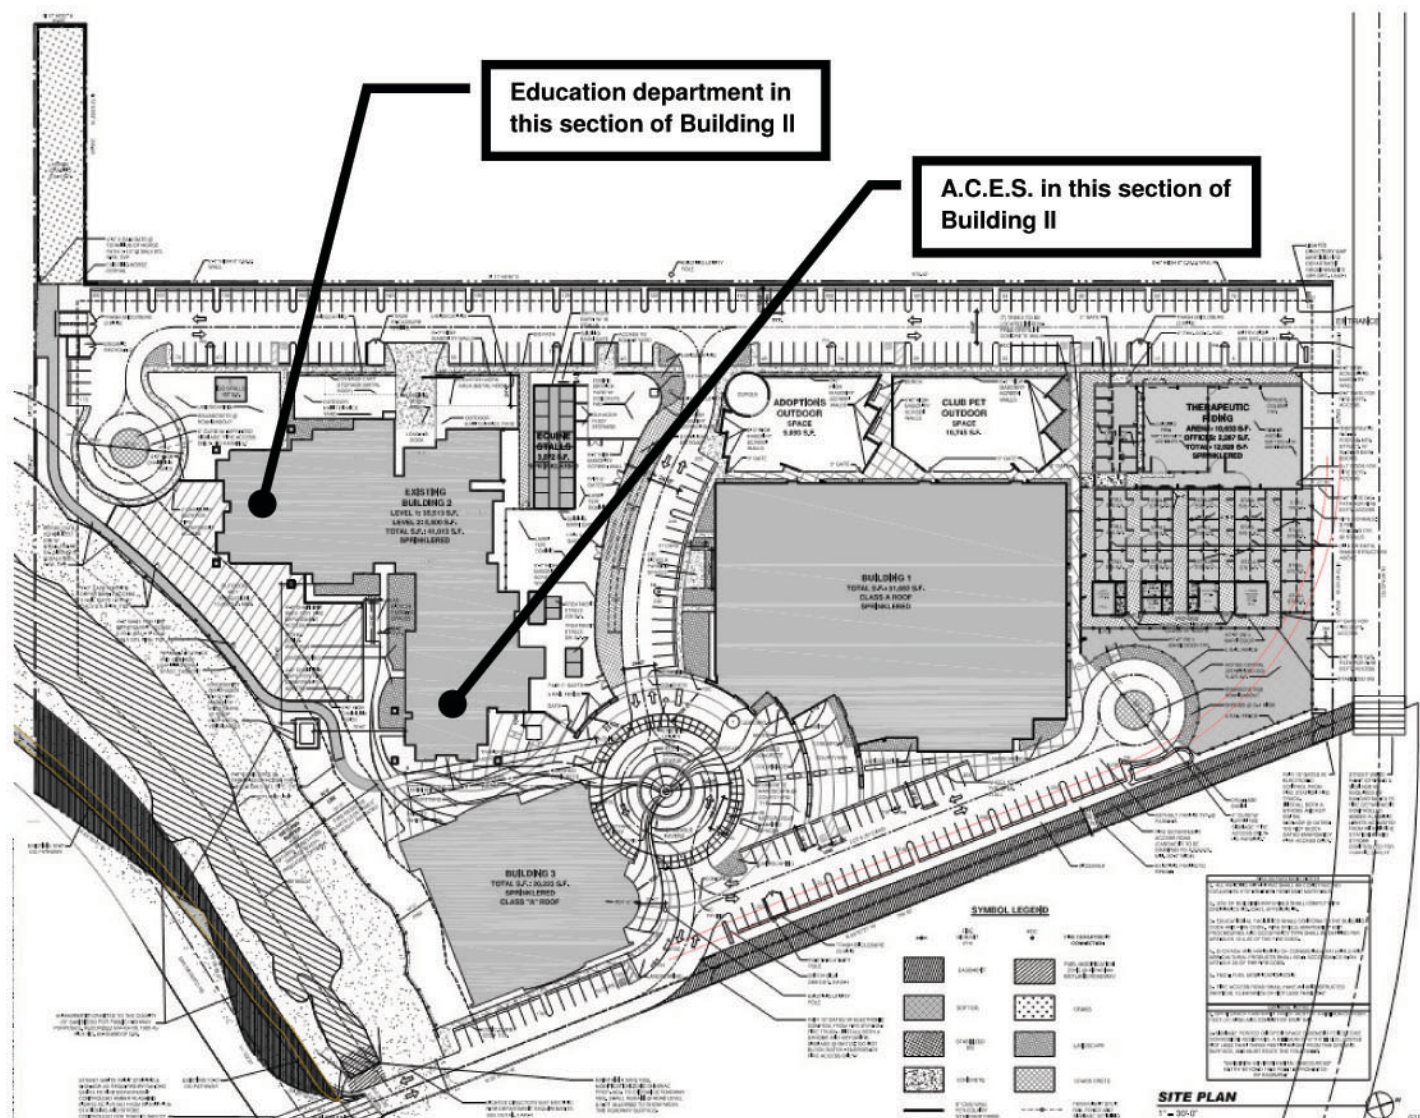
Project Site Plan and Noise-Sensitive On-Site Uses
